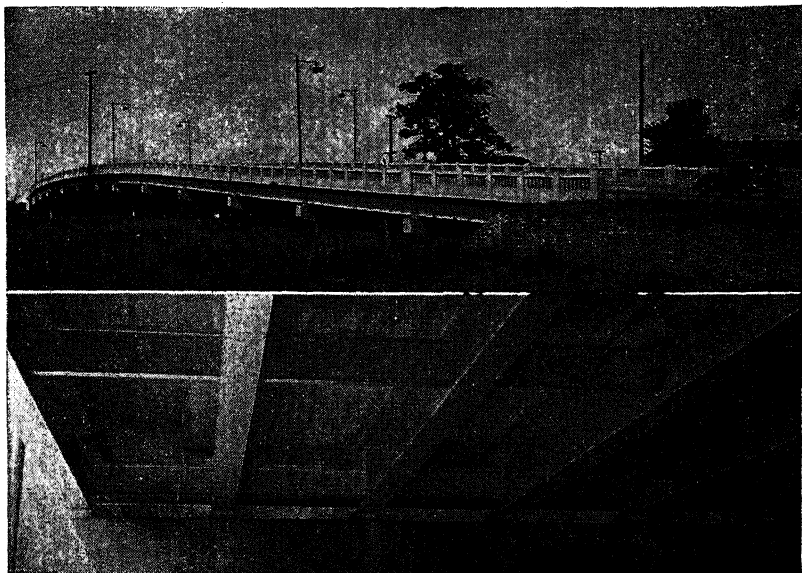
Over pass of welded steel construction. Length 900 ft. Consists of 24" I-beam stringers with three cross beams per span as shown at bottom.
